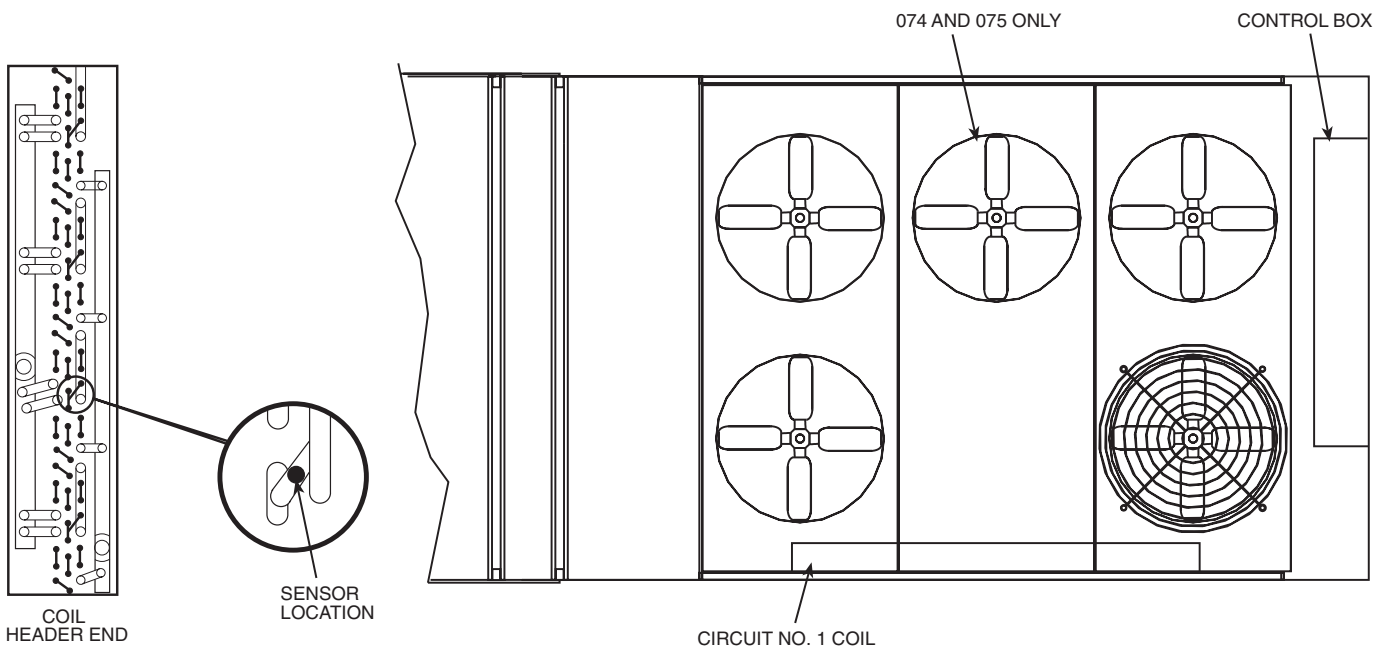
Motormaster I Control Sensor Location, Size 054-78 and 055-075 Units
